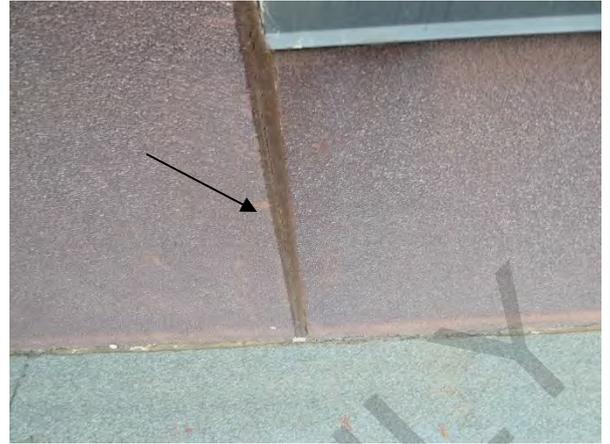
Cement sheet cladding has been sealed at the base of terraces and balconies.
